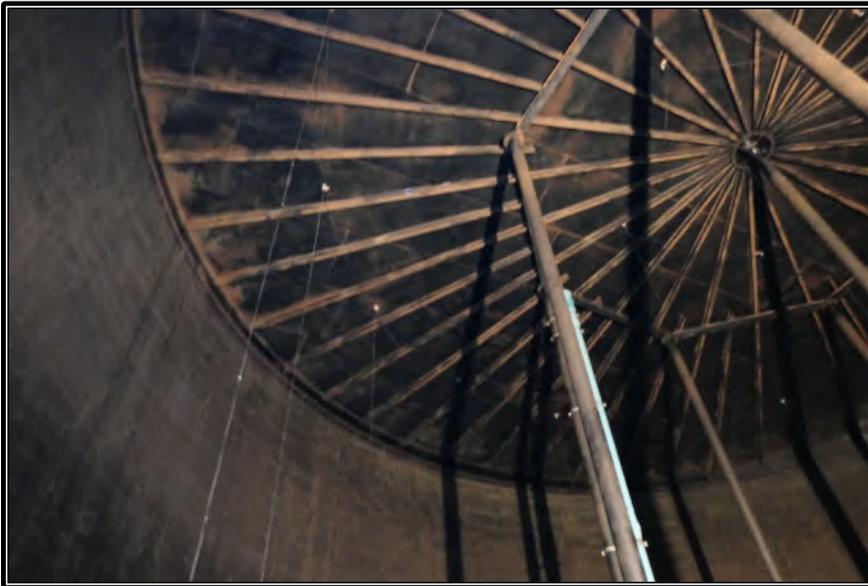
Marietta Reservoir – Column and rafter support girders
